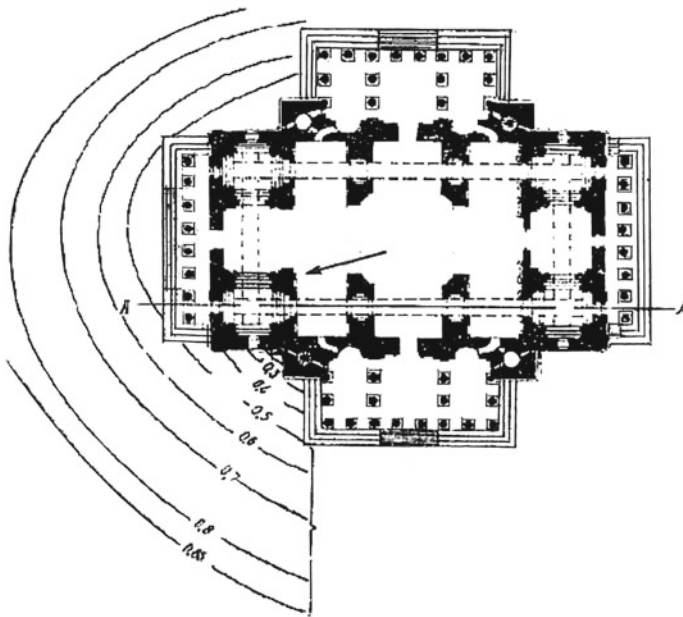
The plan of the Cathedral on the floor level. The arrow shows the slope direction of the pile raft
